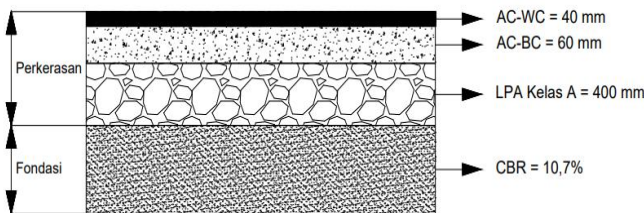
Sketch of the Banggoi-Bula Road pavement structure design
